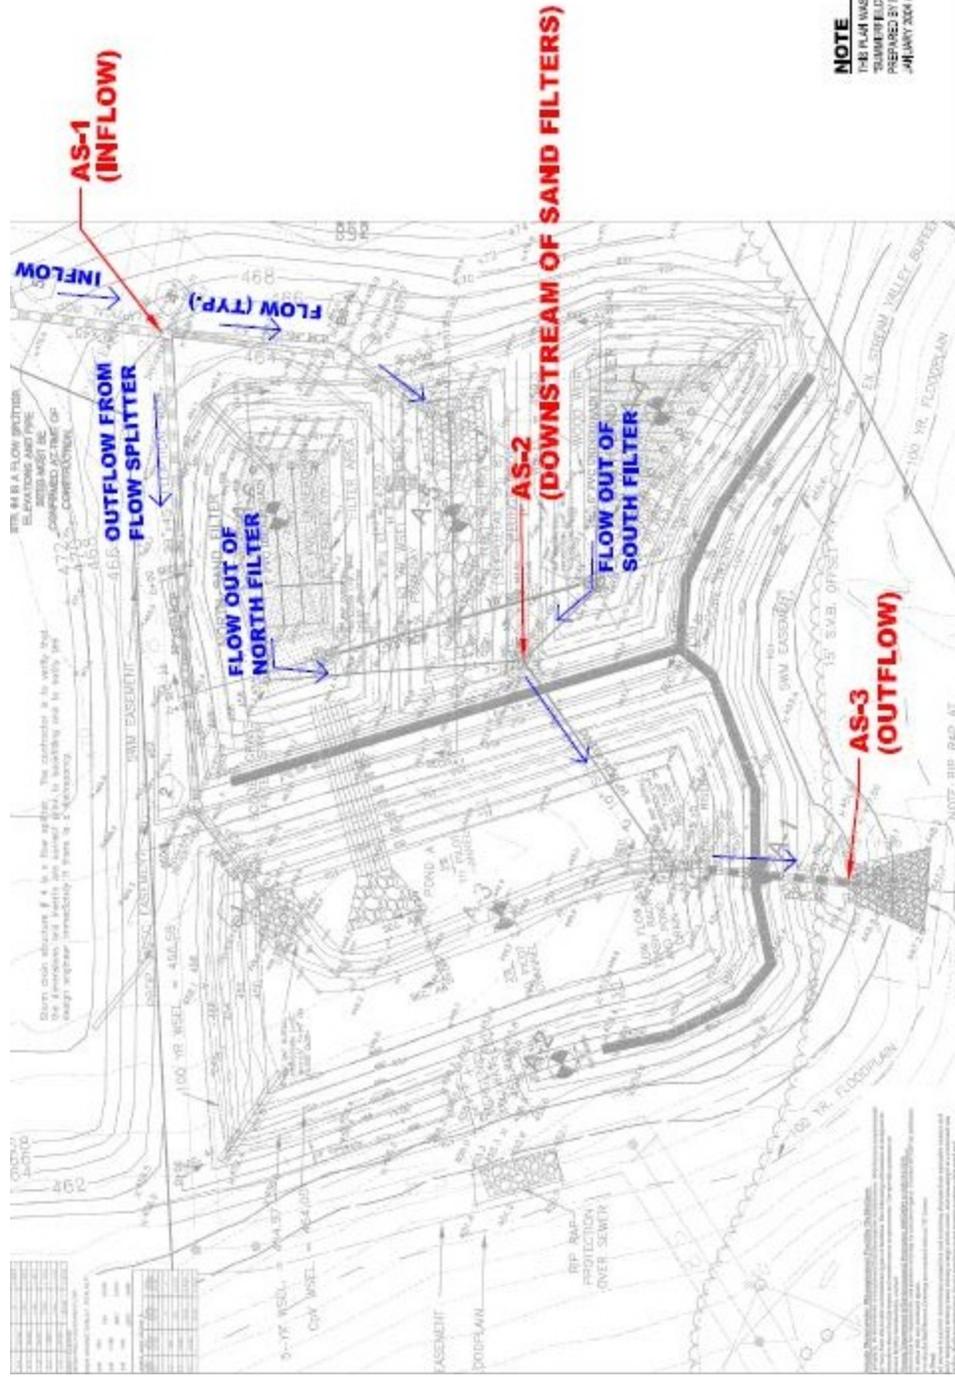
Plan view of Summerfield Crossing BMP with monitoring locations (3) denoted (Jones 2008b).
